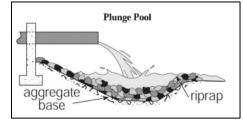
Plunge pool (Outlet Erosion Control Structures, n.d.)
